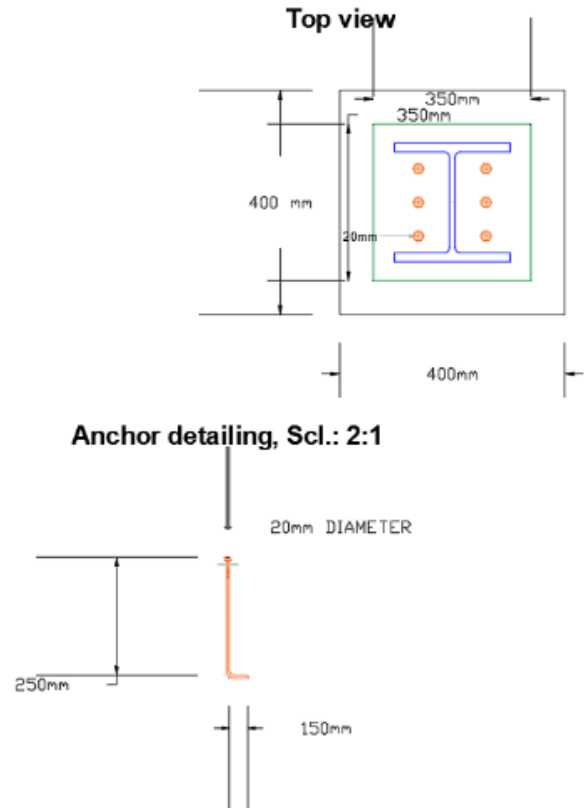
a Structural Drawing of Anchor Bolts
